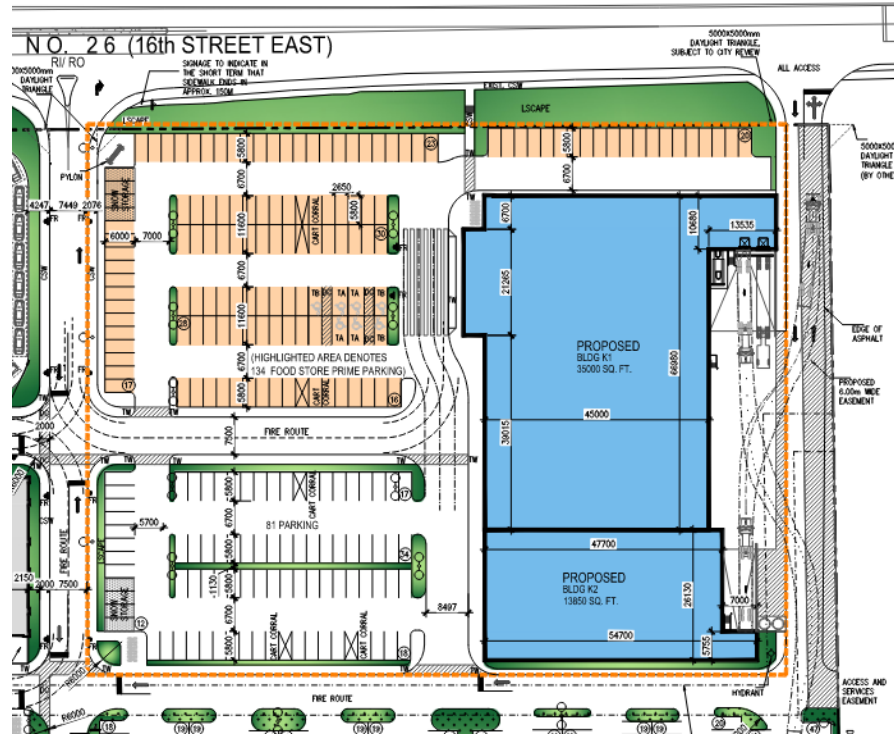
Proposed Site Layout for North-East Quadrant of Heritage Grove Centre
